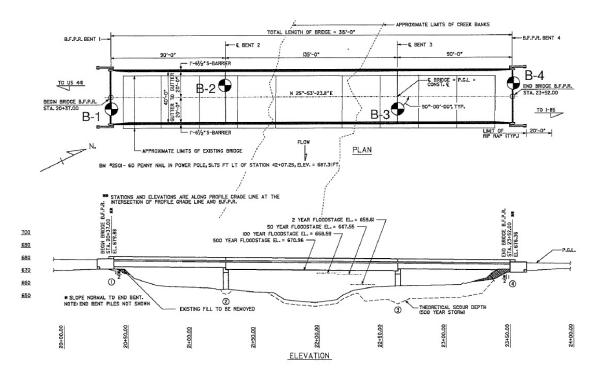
Drawing. Preliminary layout of the project site (GDOT Office of Materials and Testing 2021).
